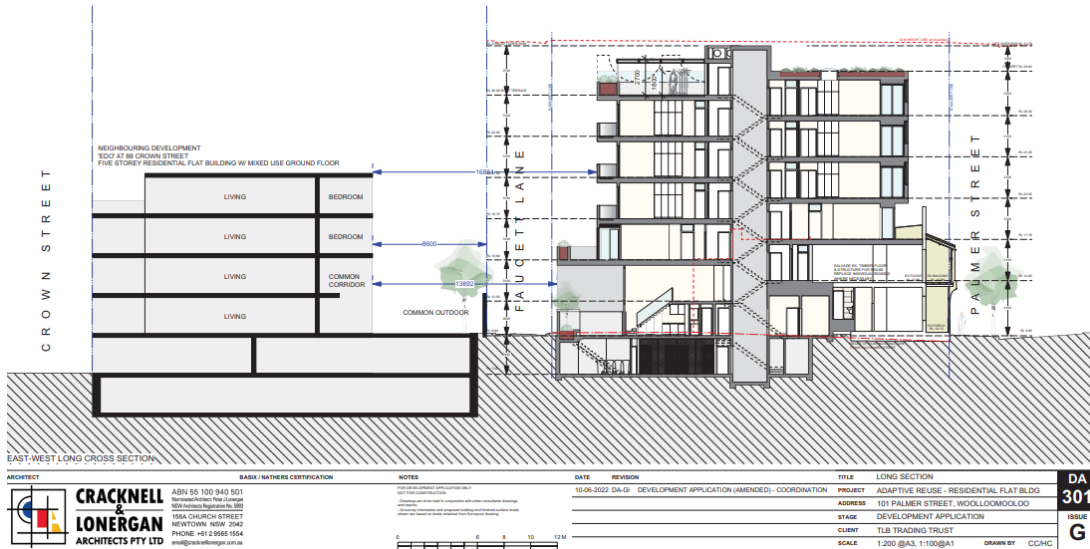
Proposed context long section, demonstrating separation distance to 'Edo' at 76-88 Crown St, Woolloomooloo
